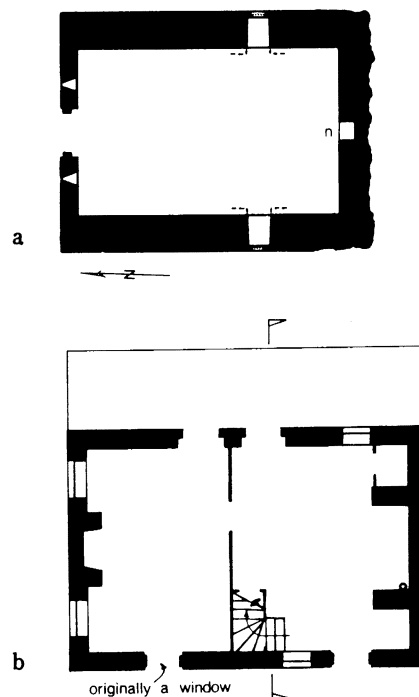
Fort Paul Long. Cellar and first-floor plans.
